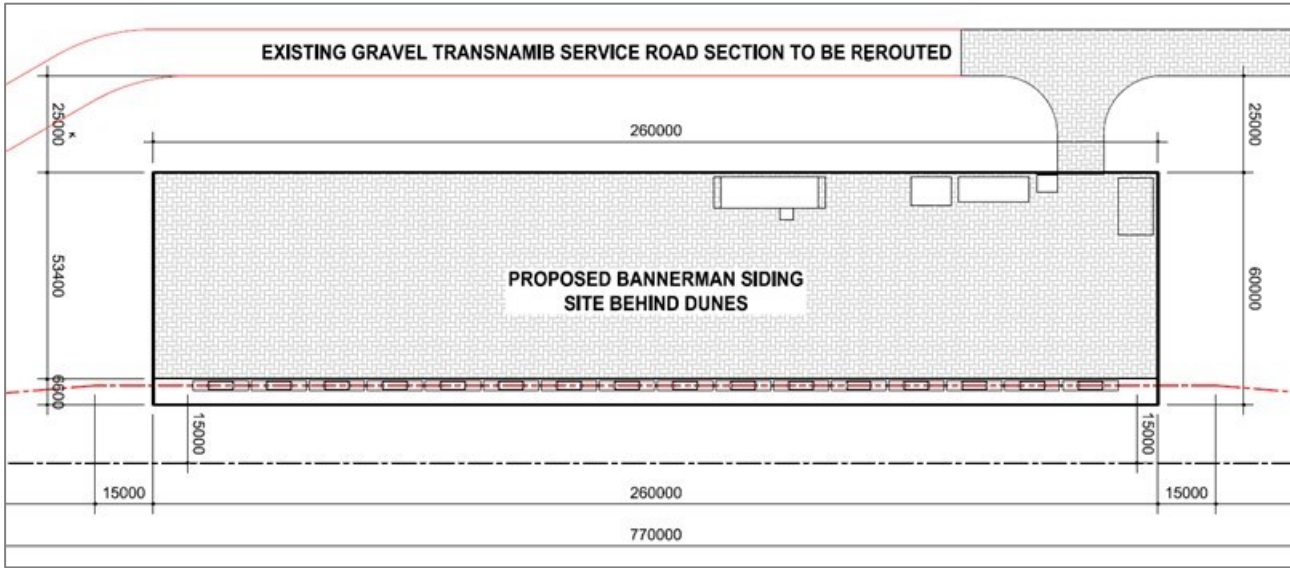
General layout of the Bannerman Multi-modal railway siding
